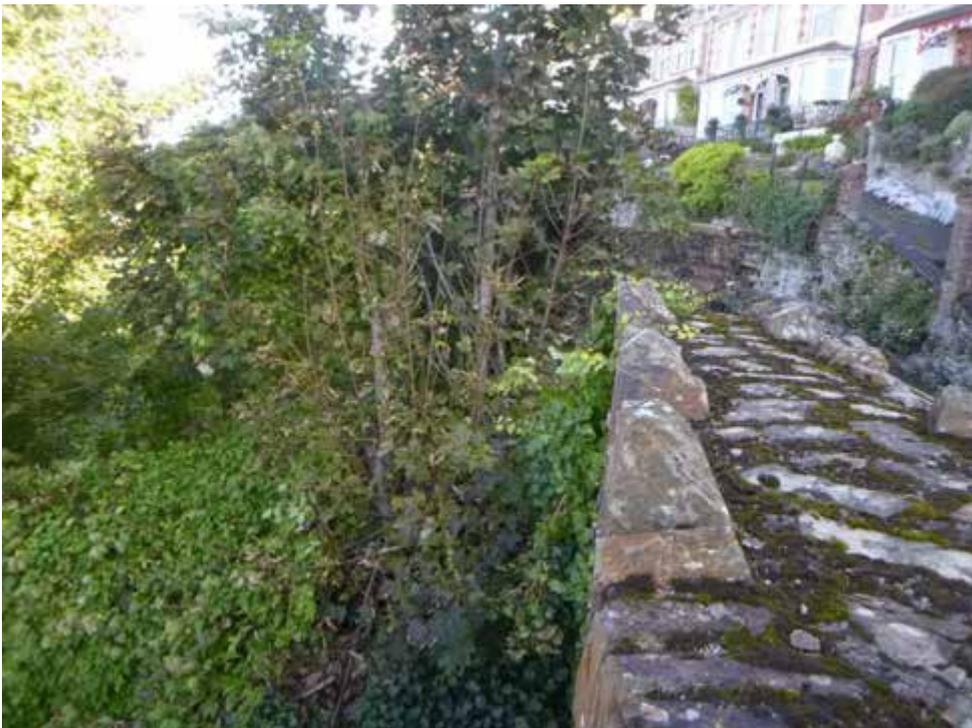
Parapet in good condition some leachate, vegetation visible on wall.
